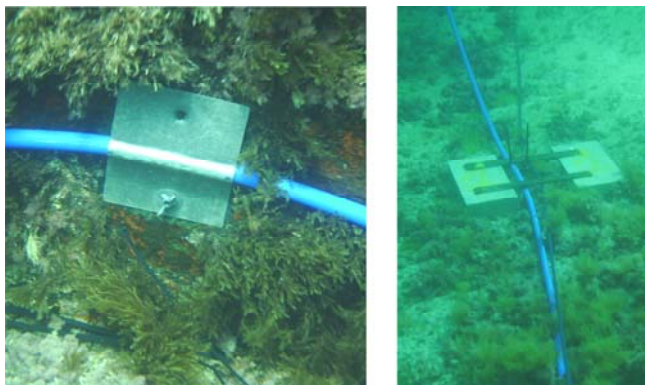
Concrete anchors (right) and metallic pieces (left) to fix the cable at the bottom and to the dock wall.
